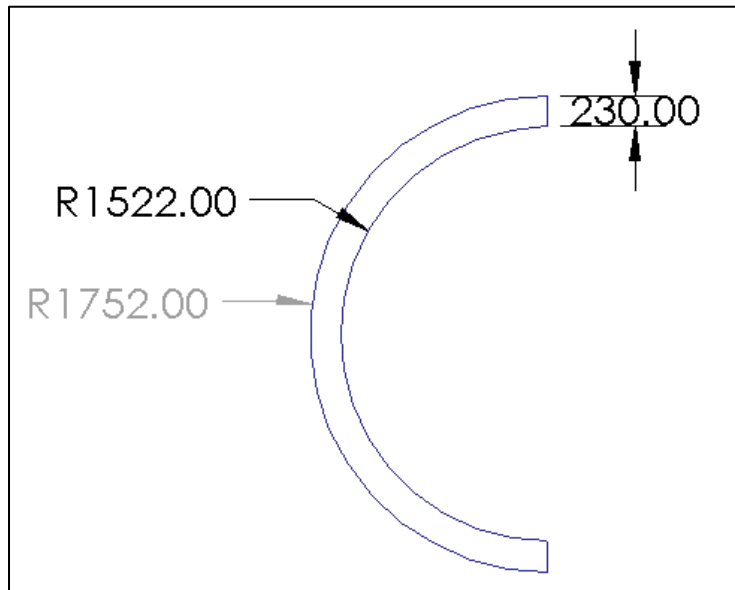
Details of Ring Girder (All Dimensions are in mm)
